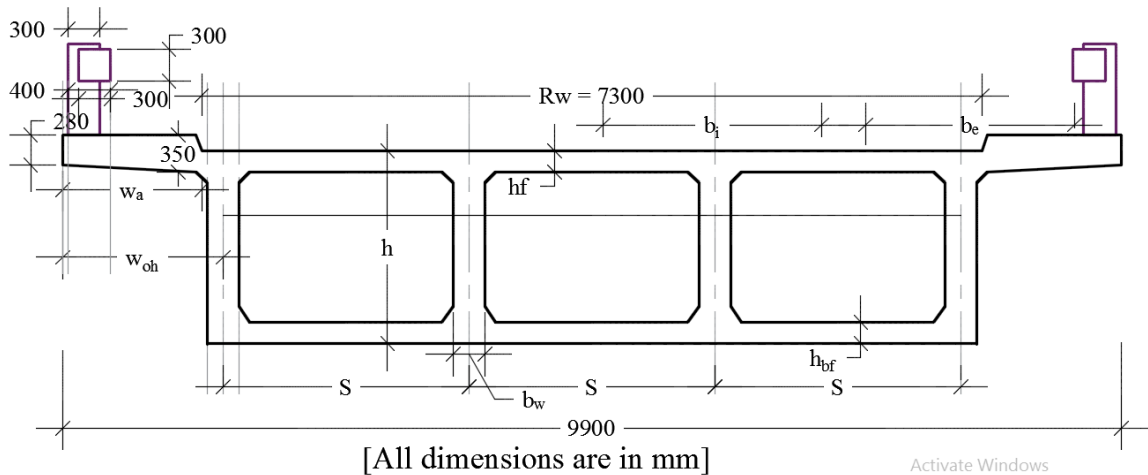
Cross Sectional Model of Box Girder Bridge
